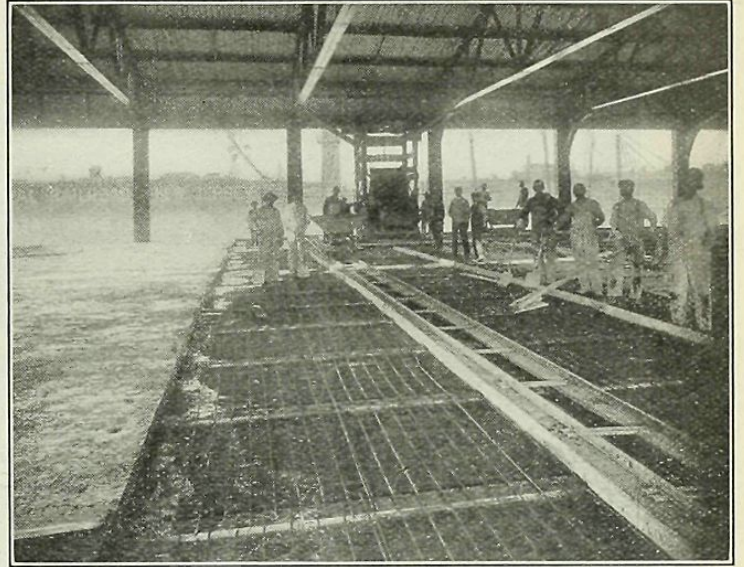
PORTABLE TRACK, REINFORCEMENT AND CONCRETE SPREADERS IN FOREGROUND.
